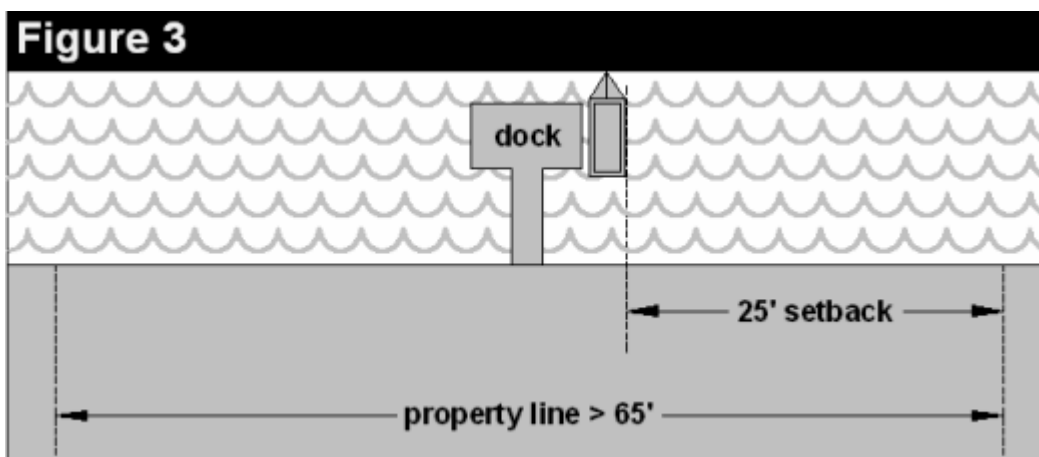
Dock Setback with Access Walkway and Mooring Area
